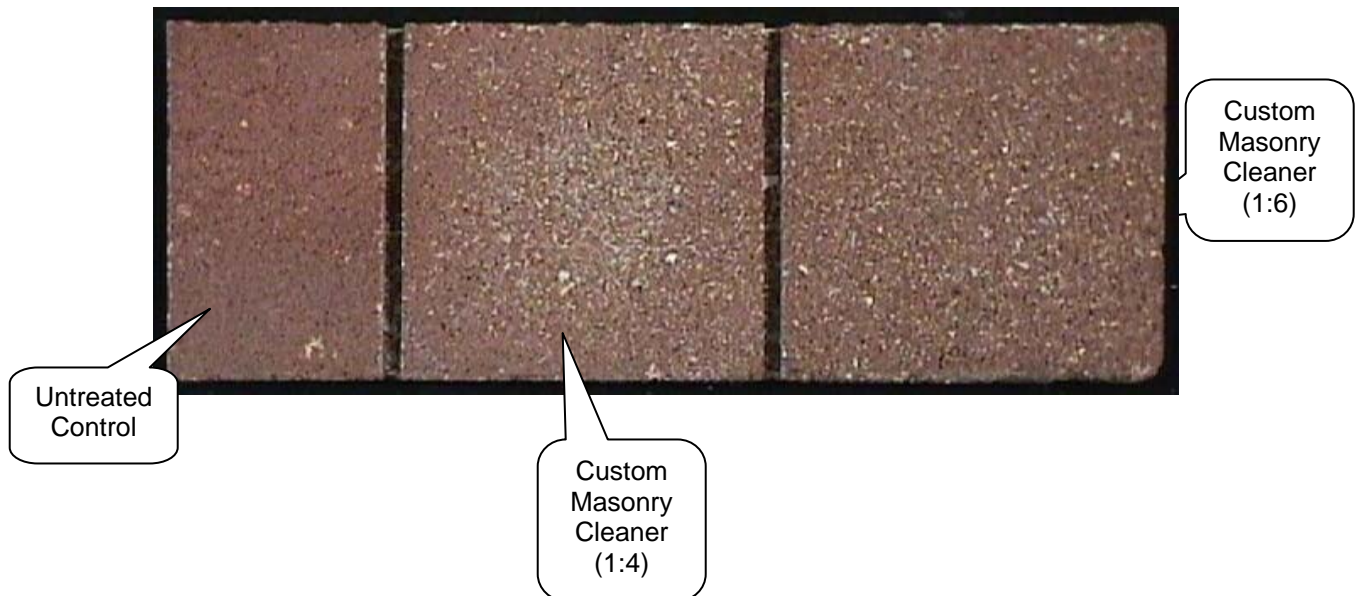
PHOTO B – “Guanston Blend” concrete brick cleaned with Custom Masonry Cleaner
